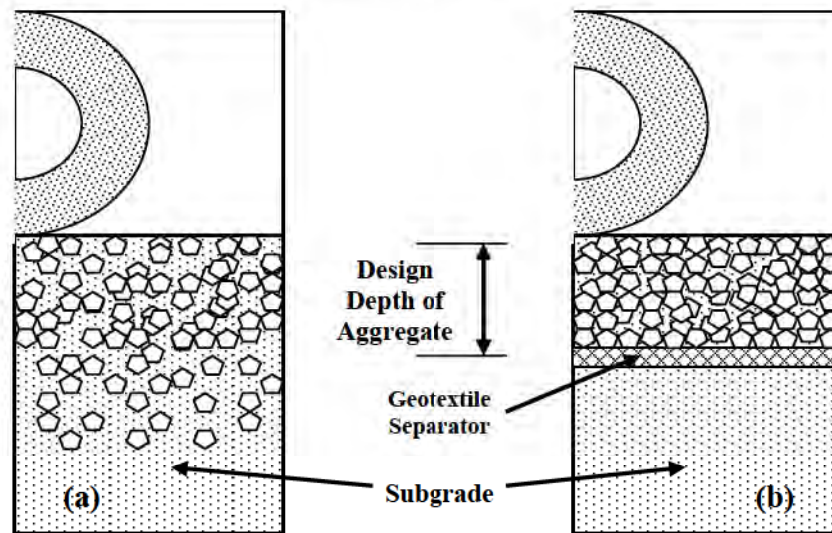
Unpaved road (a) without and (b) with a geotextile separator.
